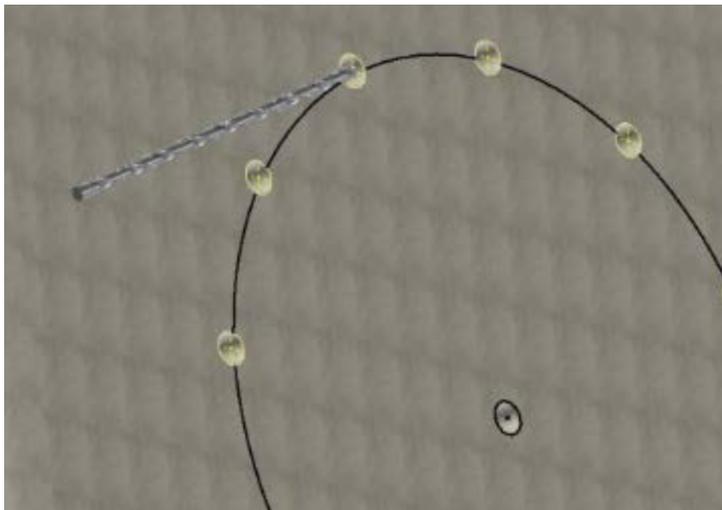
The resulting hole is approximately 100mm larger than the CasTemp block diameter.
